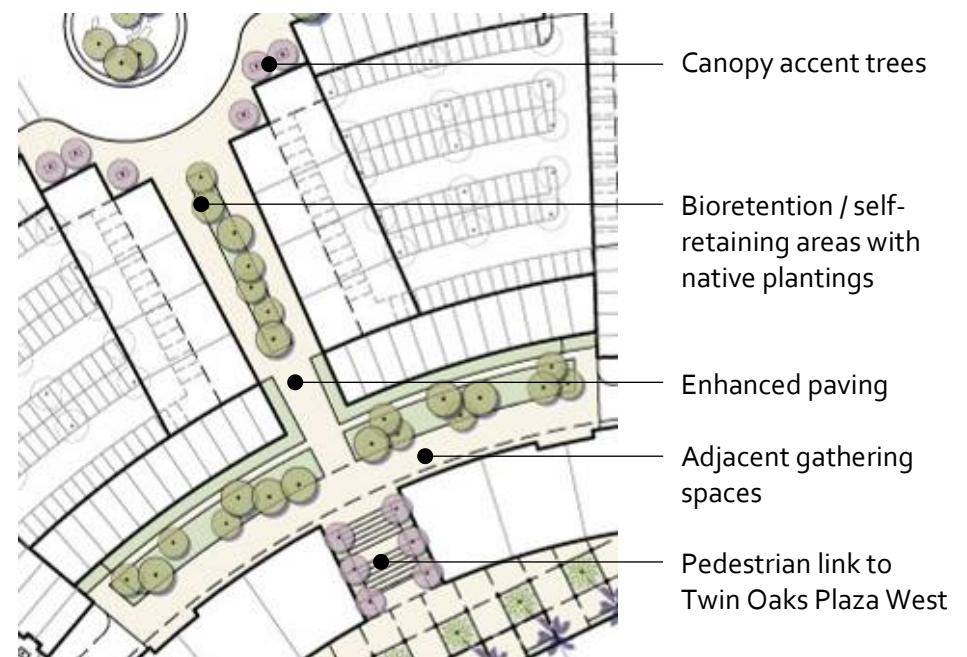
FIGURE VI.GI: Typical West Paseo Conceptual Plan
